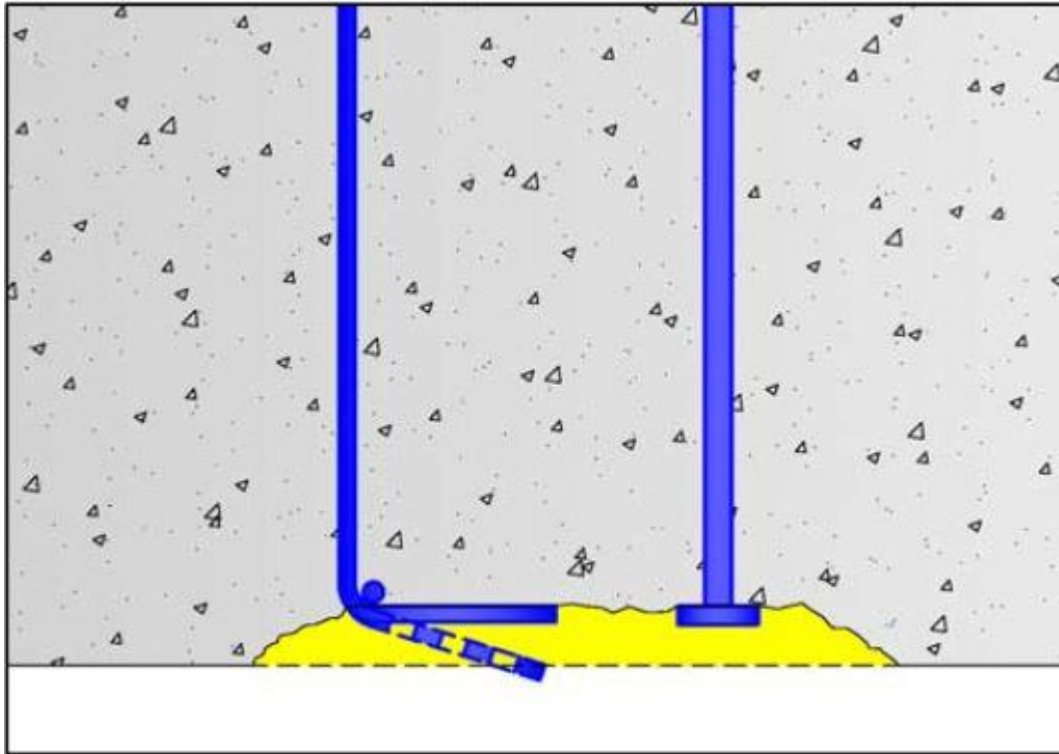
Spalling of concrete cover by straightening bend
